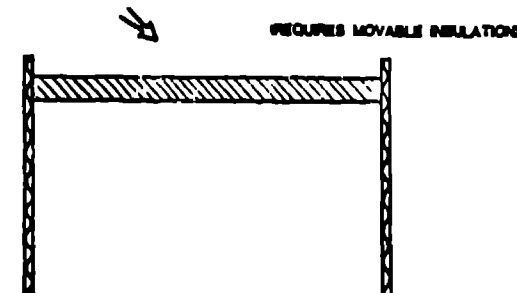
Thermal Storage Roof. This is similar to the thermal storage wall except that the interposed thermal storage mass is located on the building roof.
